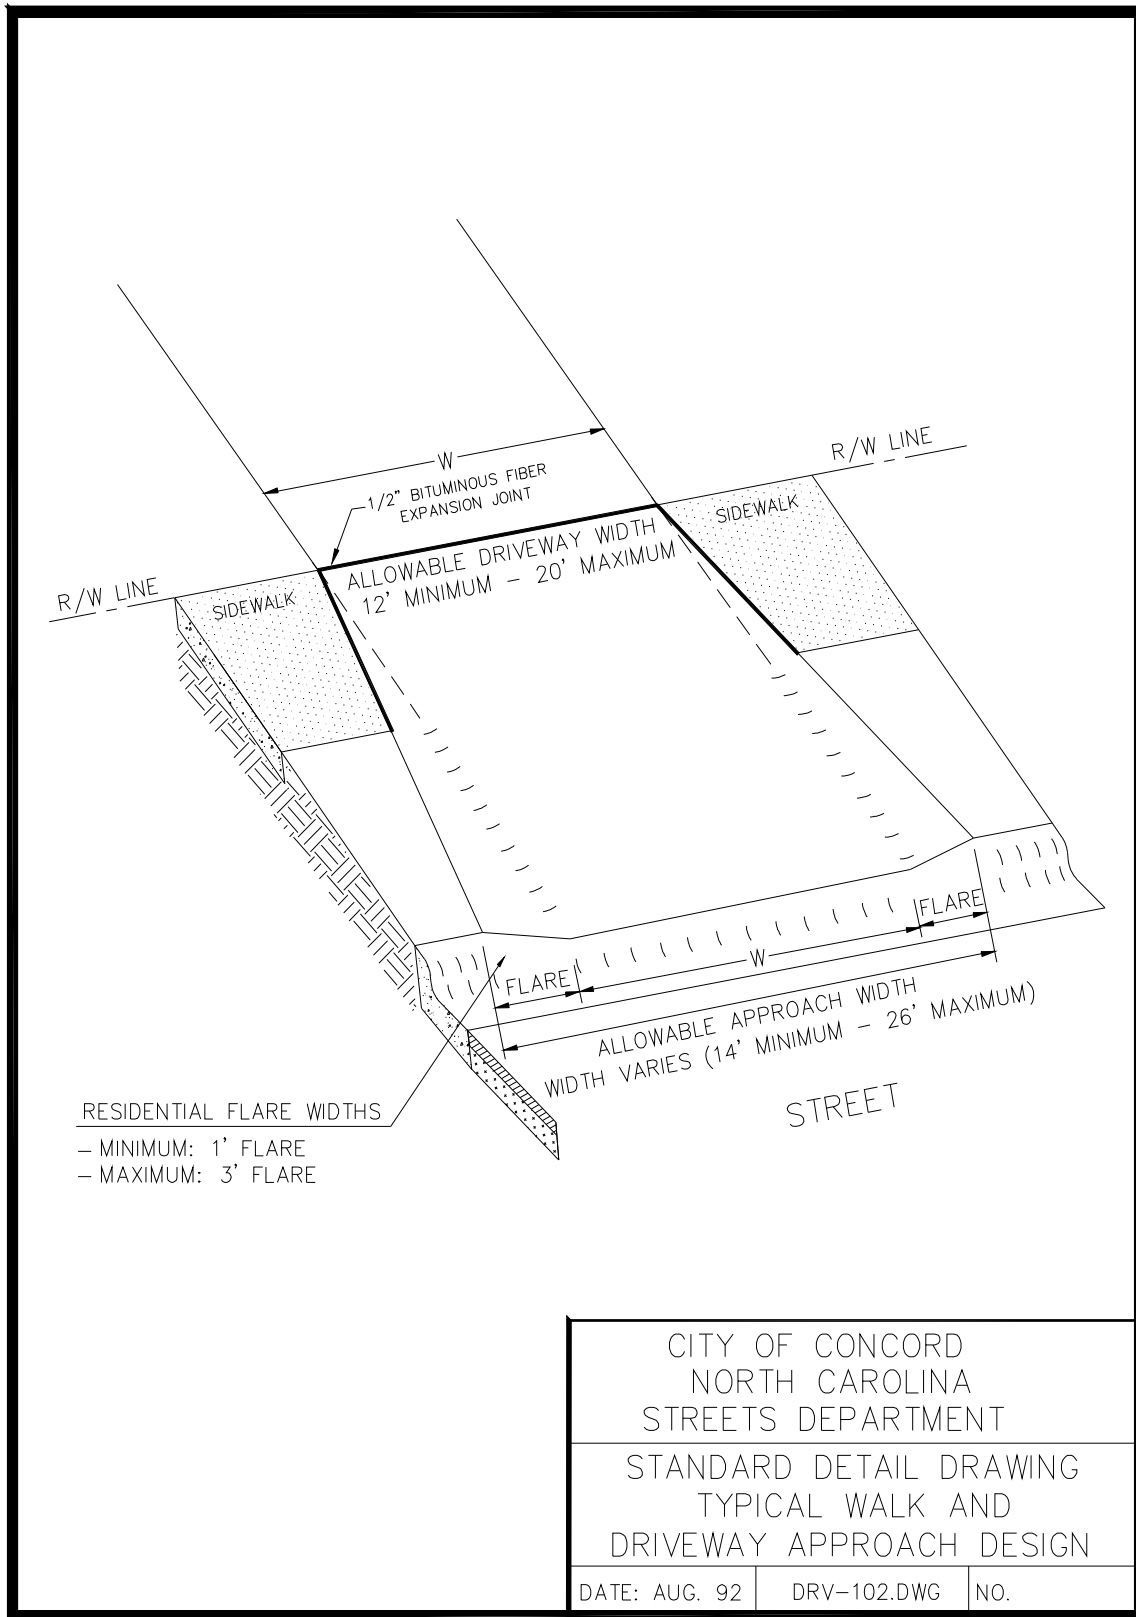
Typical Driveway Approach with Sidewalk Crossing.
